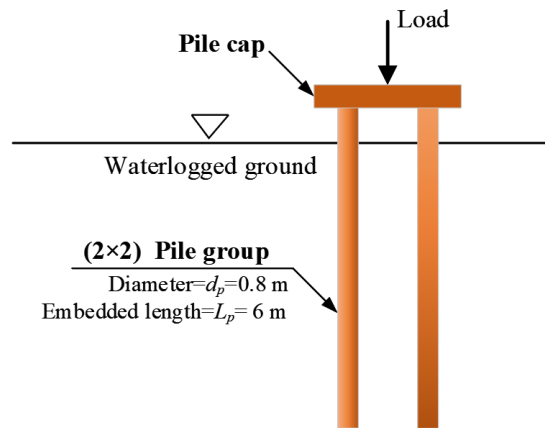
Elevation view of the (2×2) pile group in the waterlogged ground
